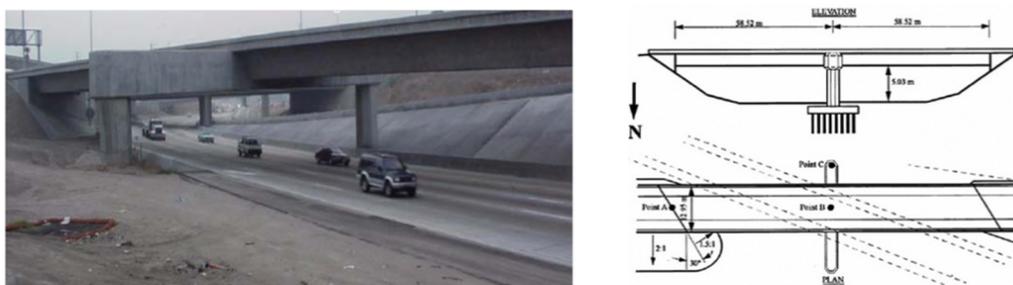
Elevation and plan views of 91/5 over-crossing (Agrawal et al., 2009).
